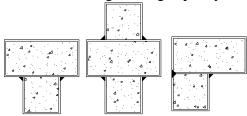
Schematic diagram of special-shaped concrete-filled steel tubular columns
